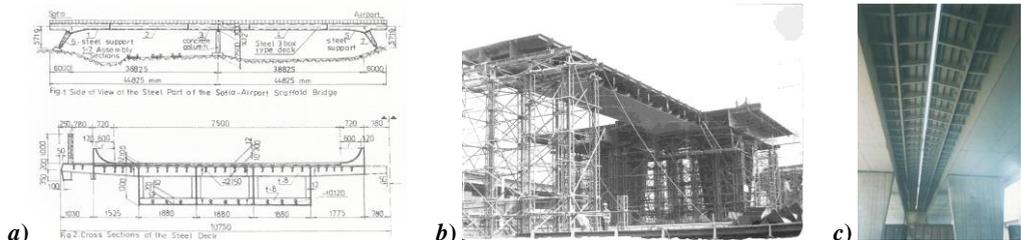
,b,c. “Brussels“ Blvd. steel bridge: Longitudinal and cross-section-a), While erecting the bridge-b), View of the orthotropic bridge-c)
